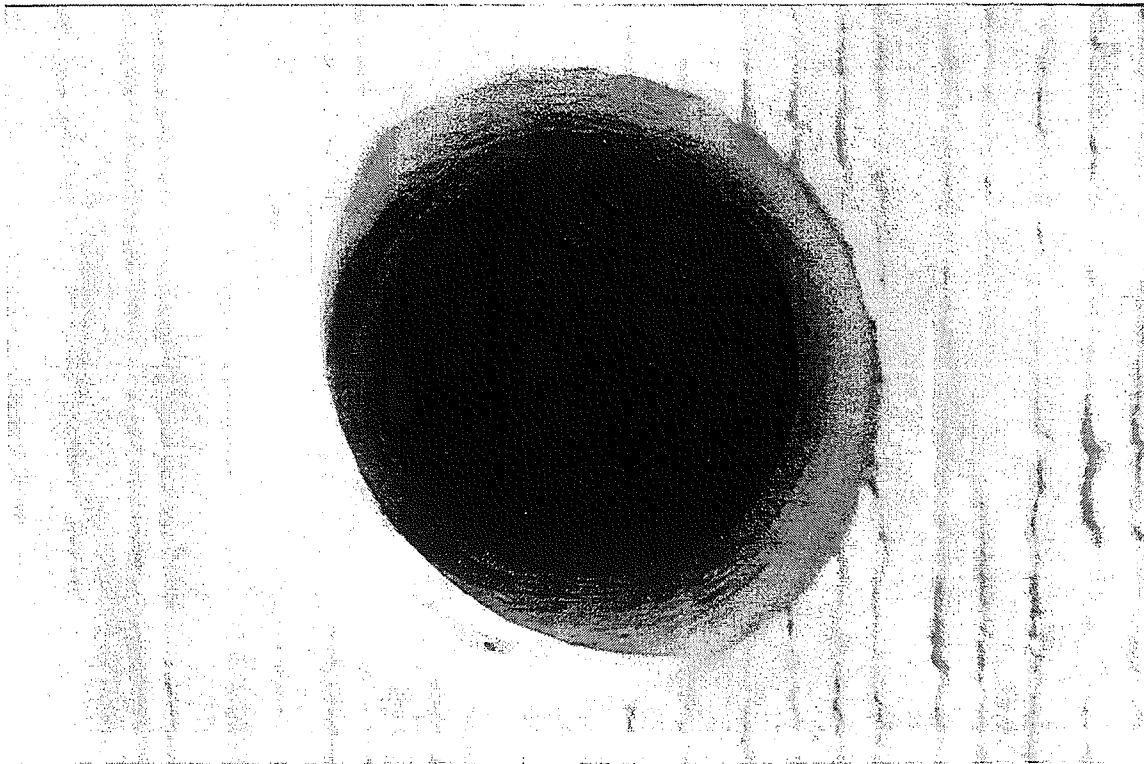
A close-up of a corehole on CSN# 44044-18804A WB. showing the OGDC base course.
